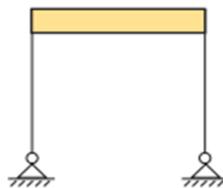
Stability system of the steel reference frame: Moment fixed connections between columns and roof beams, hinged at the base
